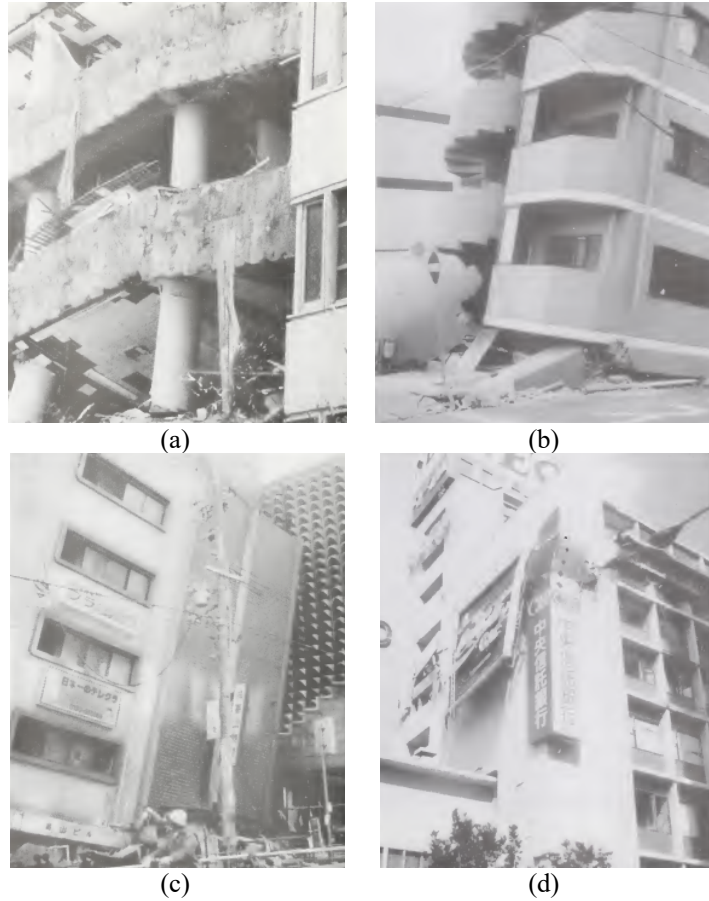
(a) “Strong beam-weak column failure; (b) Collapsed first story – commercial building in downtown Kobe; (c) Collapsed first story – Downtown Kobe; (d) Upper story collapse – Downtown Kobe” (NIST Special Publication 901, 1996).
